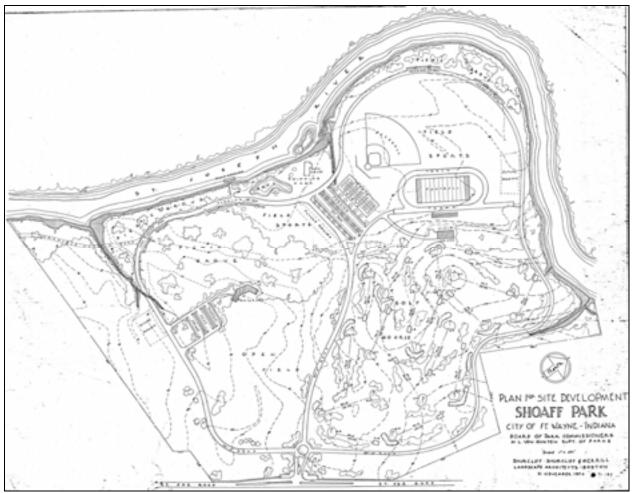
1956 master plan for Shoaff Park developed by Arthur Shurcliff of the landscape architectural firm of Shurcliff, Shurcliff & Merrill. The plan called for extensive development of the primarily open parkland, including active sports fields to the northwest, a golf course on the east half of the park, and open fields to the south. A long loop drive with adjacent parking areas circled the park, connecting the various facilities and use areas. (R-FWP-SHO-Shurcliff Plan-1956.jpg) Courtesy Fort Wayne Parks and Recreation.
